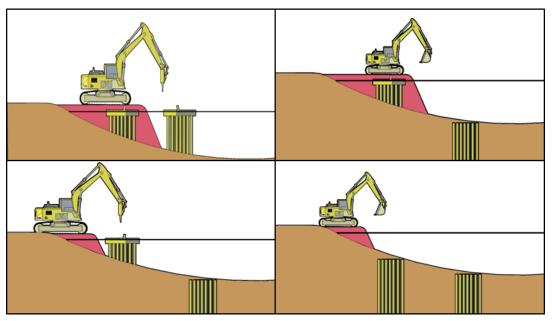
Illustration showing working platform to be used for foundation recovery
